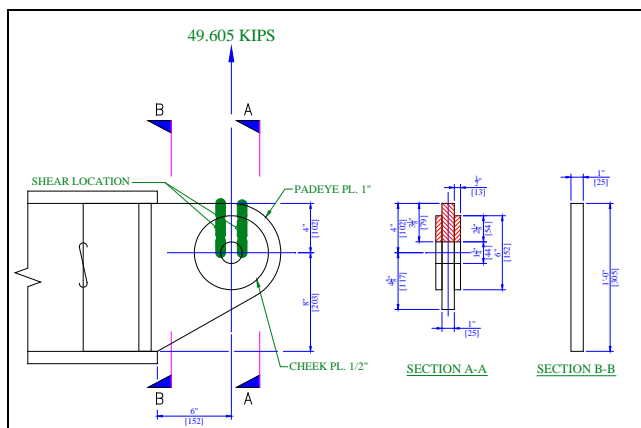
DETAILS OF LIFTING FRAME PADEYE
